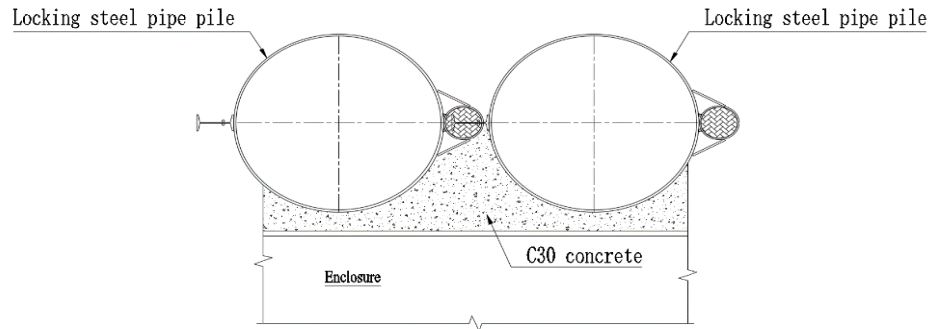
Schematic Diagram of Concrete Filling between Locking steel pipe pile and Purlin
